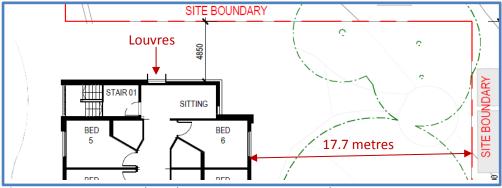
Extract First Floor Plan Source: Jackson Teece
